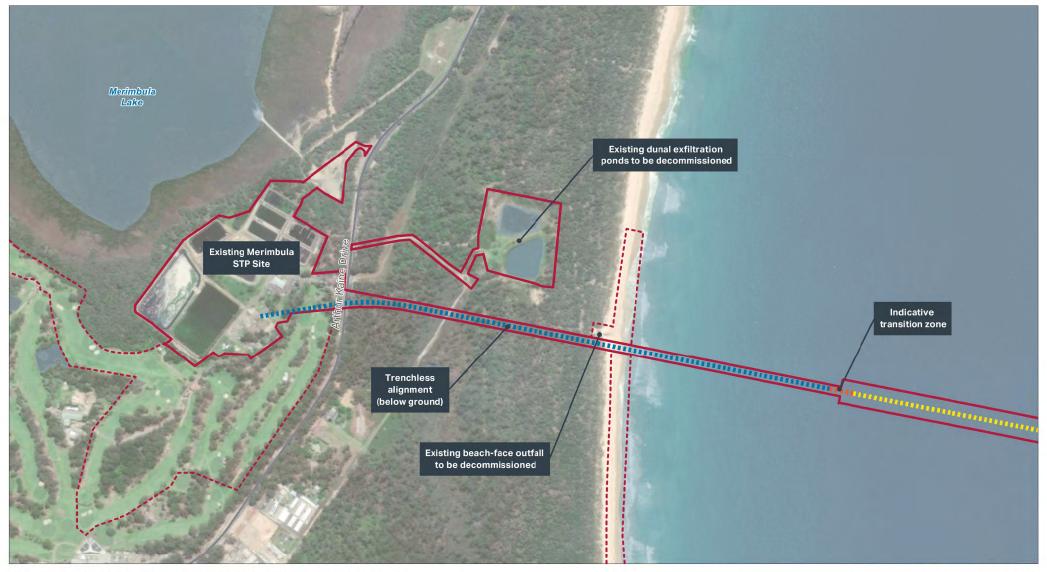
OCEAN OUTFALL PIPELINE - SECTION 1 (BELOW GROUND)
